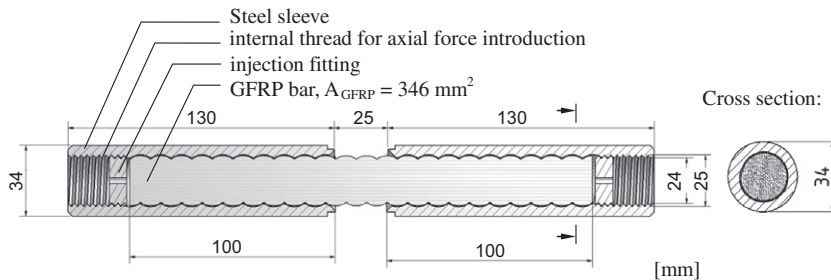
Longitudinal section and cross section of the steel-GFRP element.
